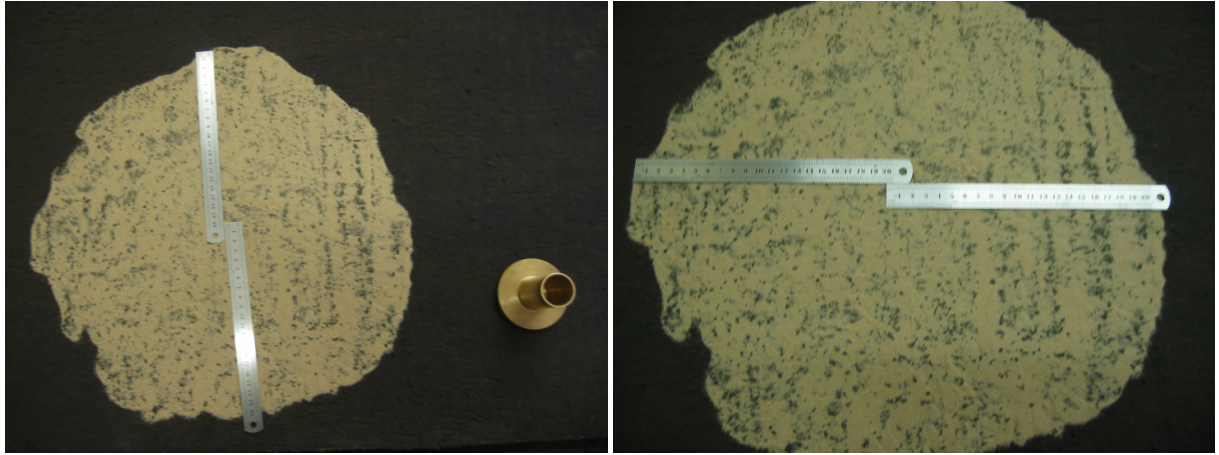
Sand patch test on the slurry after the last fill (Fill 3)
